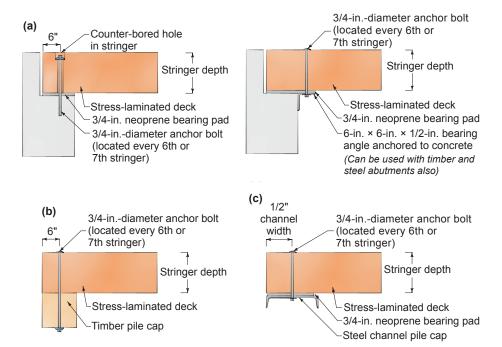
Stress-laminated glulam deck bearing details: (a) deck to concrete abutment details; (b) deck to wood abutment details; and (c) deck to steel abutment details.
